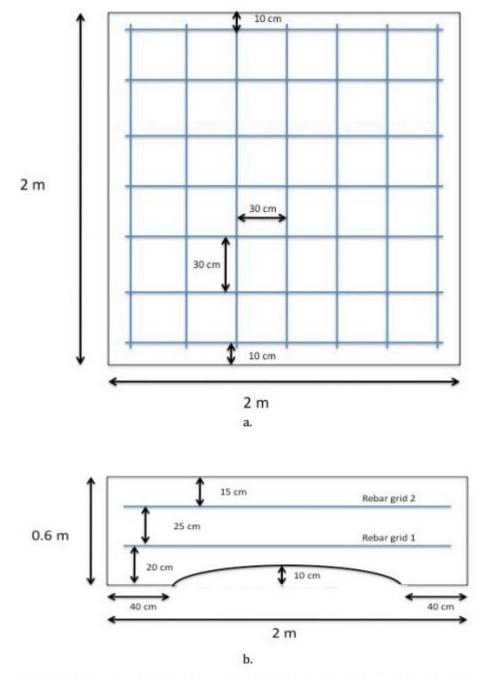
Top view (a) and side view (b) of arrangement of internal reinforcing rebar. Rebar elements are shown in blue.
